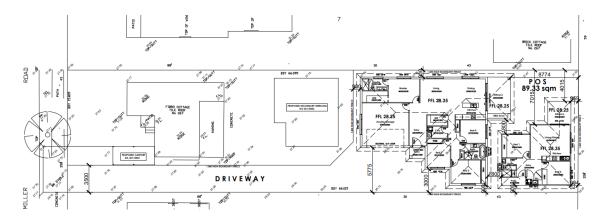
Extract of proposed single storey dwelling house and secondary dwelling (Source: Inkon Plans, 2022).
